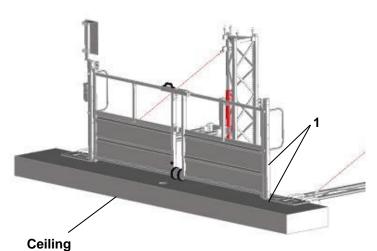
Mount hinged floor gate to the floor of the applicable storey (variant 1)
